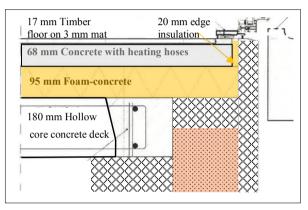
Vertical section at the facade showing the floating concrete floor on foam concrete.
